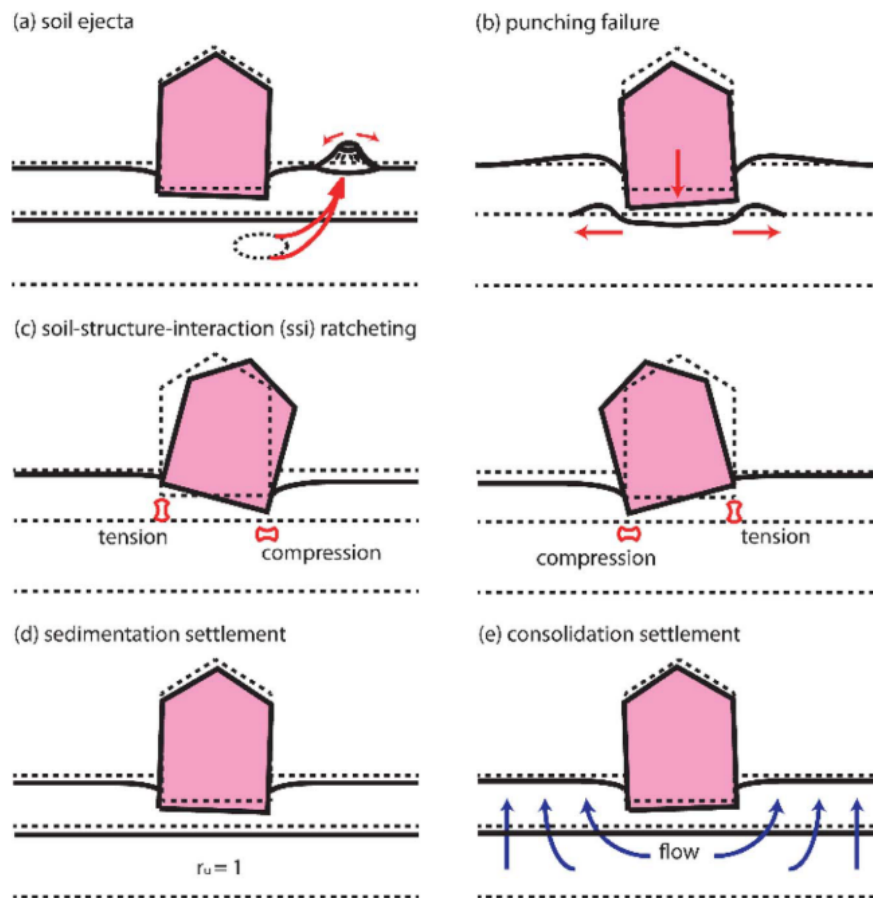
Liquefaction induced building displacement mechanisms for structures with shallow foundations on level ground: (a) ground loss due to soil ejecta, (b) punching failure, (c) soil-structure-interaction (SSI) ratcheting, (d) sedimentation, (e) post liquefaction reconsolidation (Dashti & Bray 2013, Bray & Macedo 2017).
